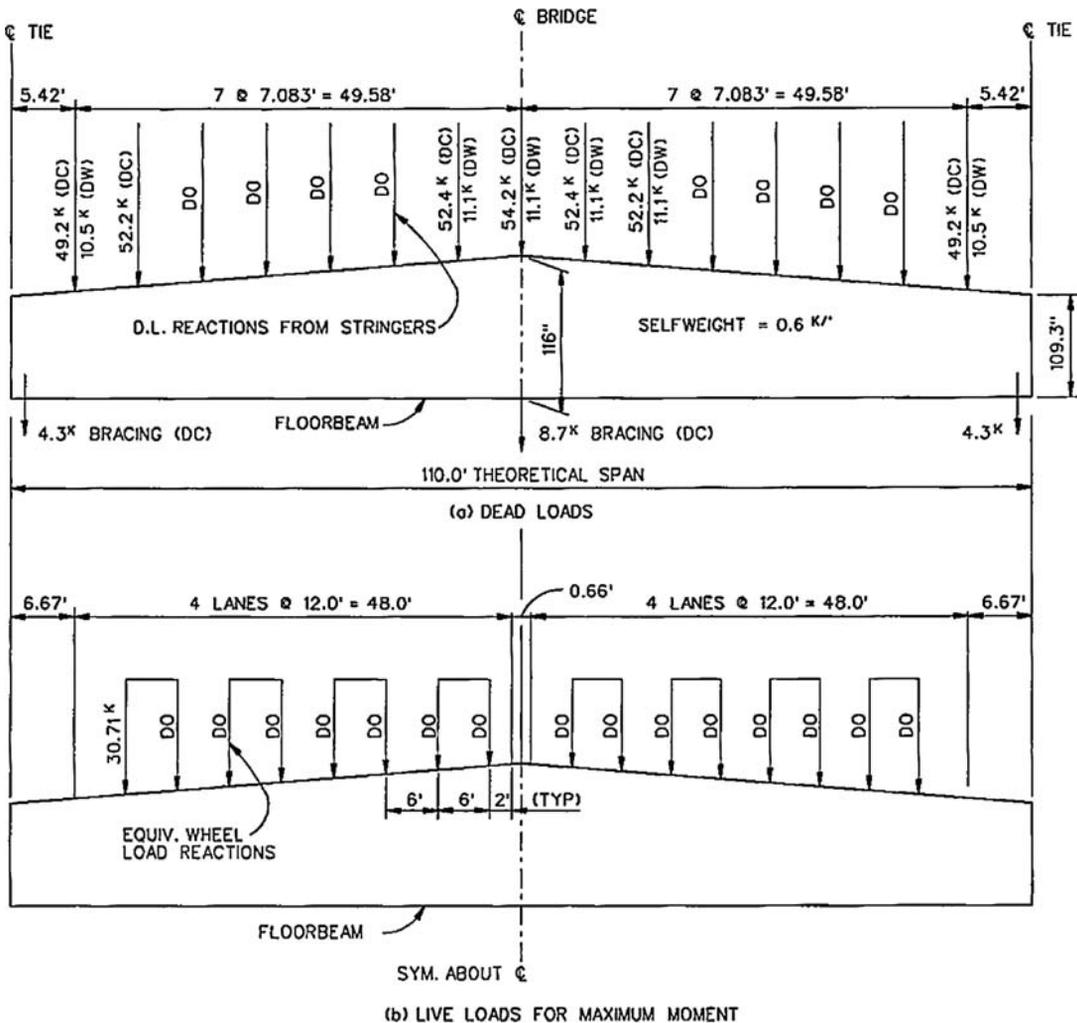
Loads on an interior floorbeam of Glenfield Bridge.
